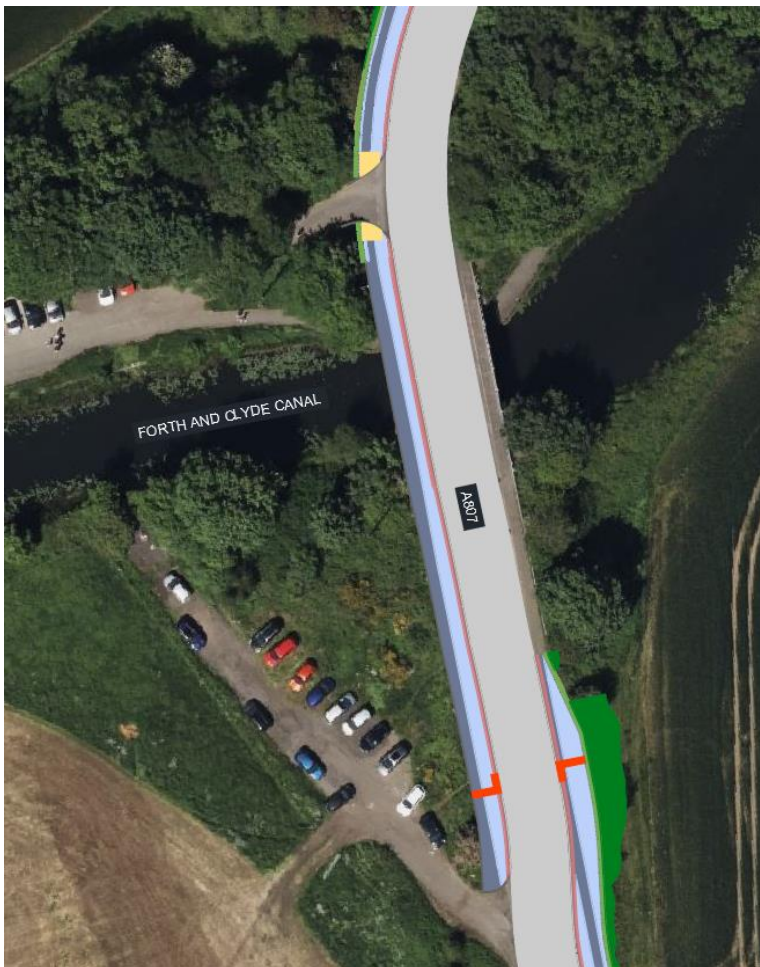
Shared-use footway switching from west to east on A807 via proposed toucan crossing.
